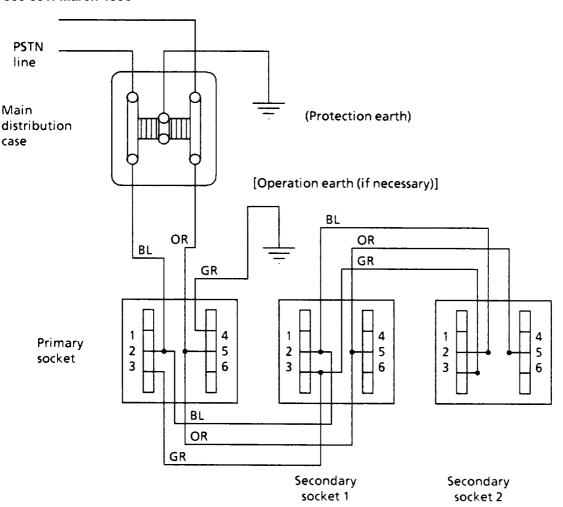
(CY) 2.1: Typical internal wiring installation
